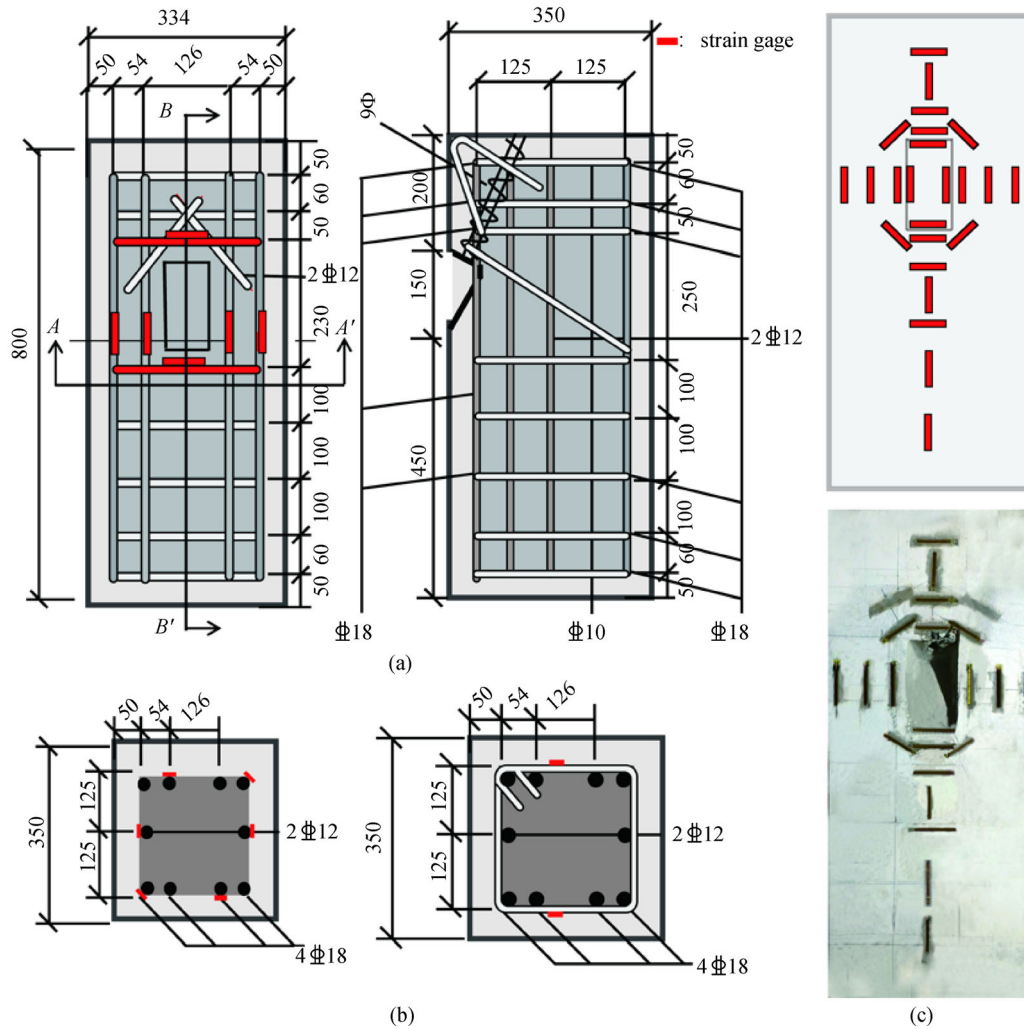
Geometry and reinforcement details of segment joints. (a) Front view and cross section B-B'; (b) cross section A-A' and steel strain gauge locations; (c) concrete strain gauge locations. (unit: mm)
